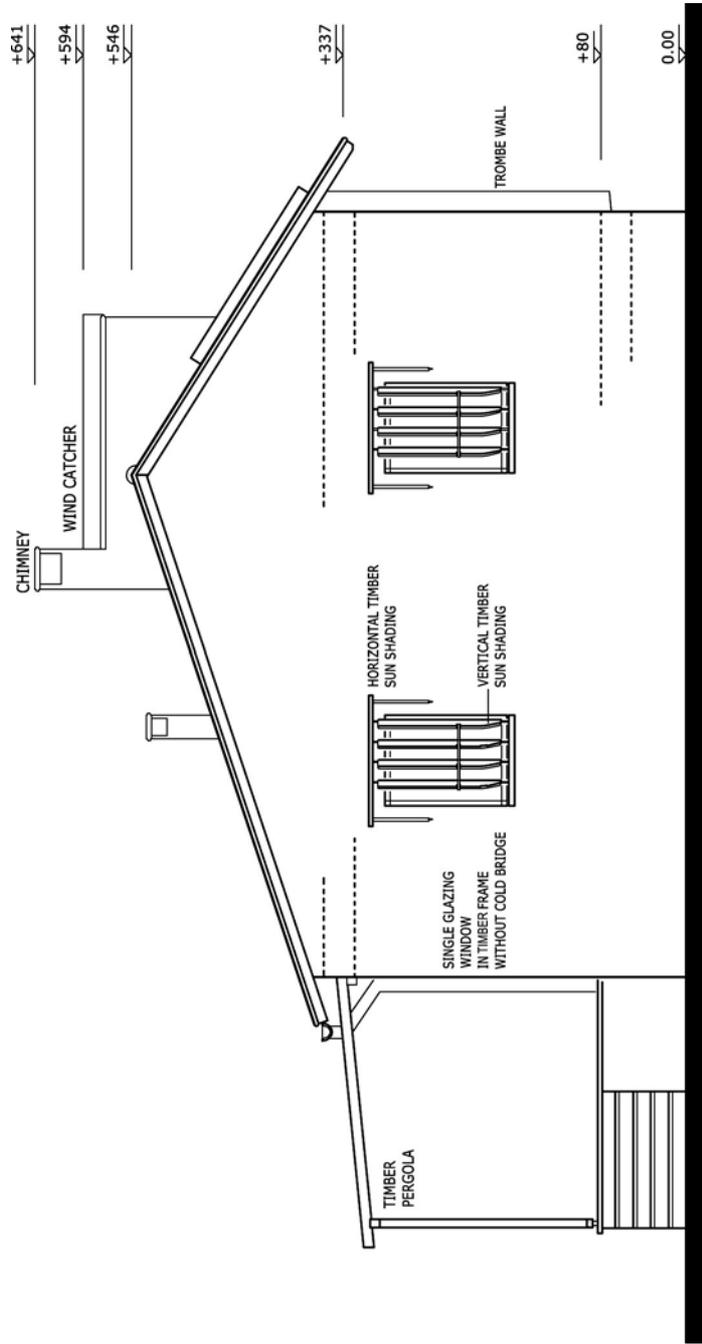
Western façade of type D₁' dwelling; Scale 1/80
